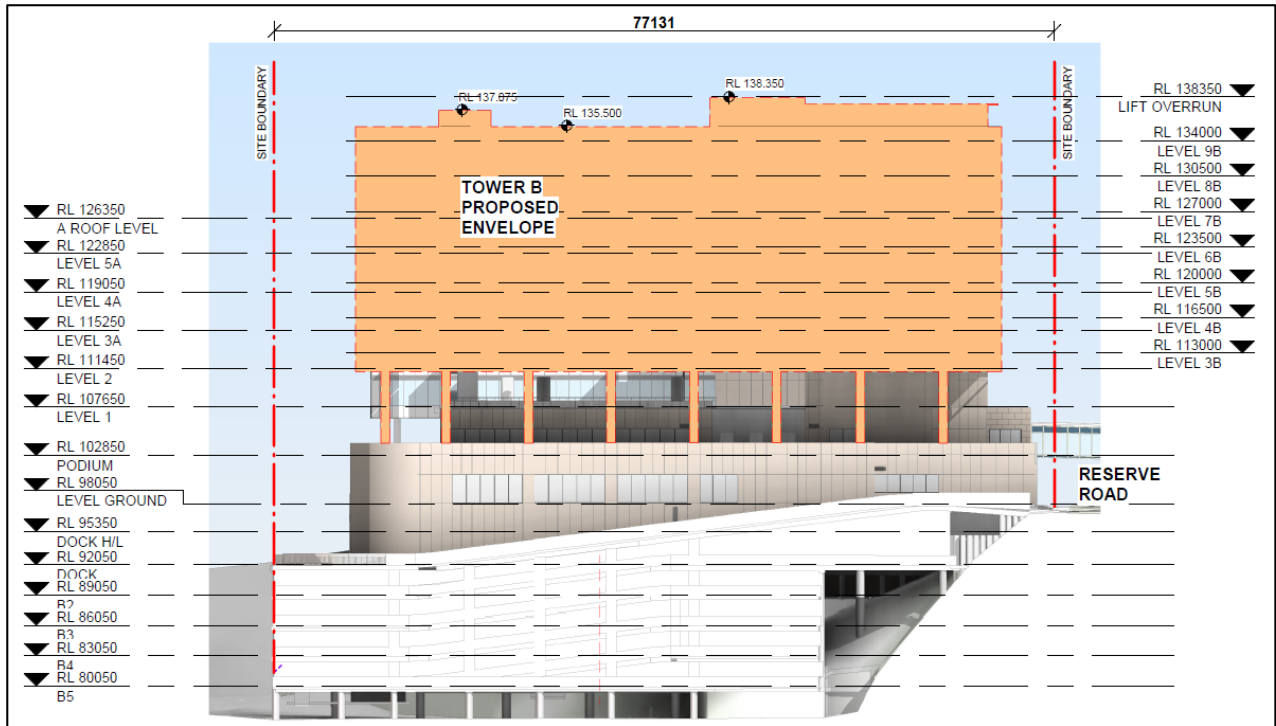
North-west elevation (Source: Tower B concept RtS Addendum)
